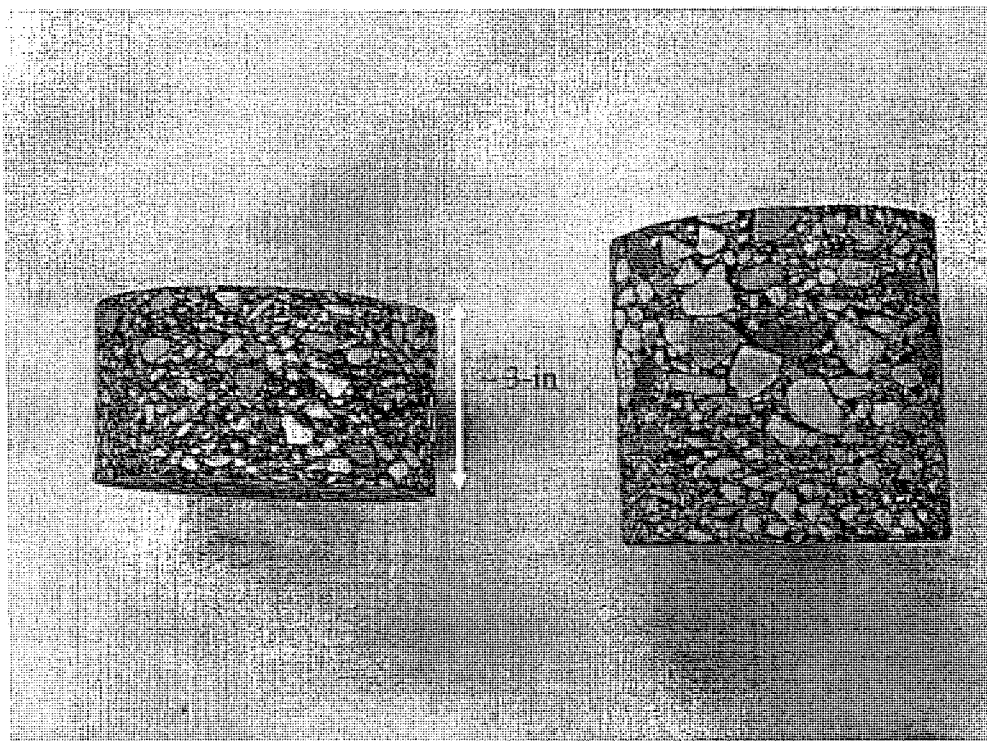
An AC test specimen (left) and a trimmed AC core (right)
